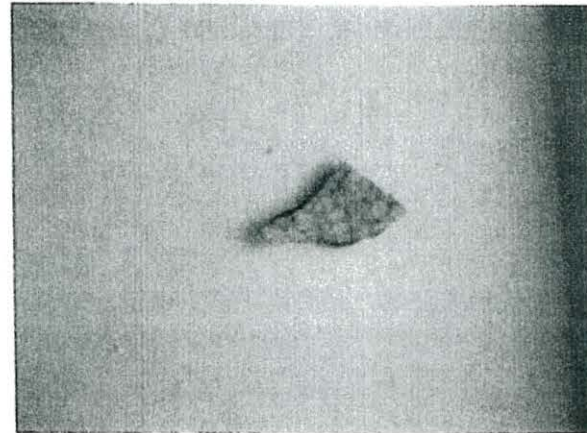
Photo of asbestos containing Pebble Sheet Floor - Beige, Samples 12A & 12B.
